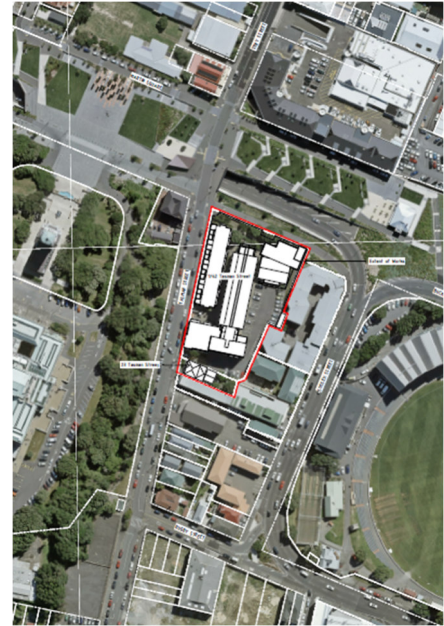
The Site in context showing existing buildings (Tasman Gardens Apartments) proposed to be demolished.
